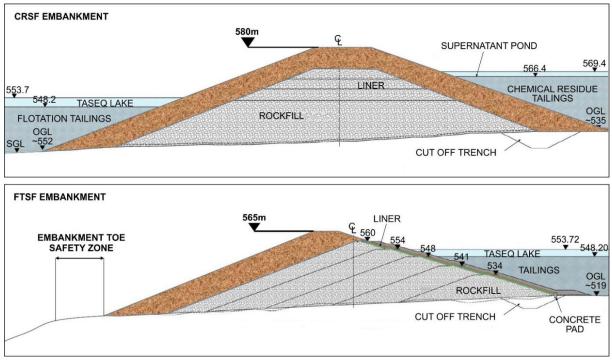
Cross-section of embankment at the CRSF (above) and FTSF (below) at year 37
